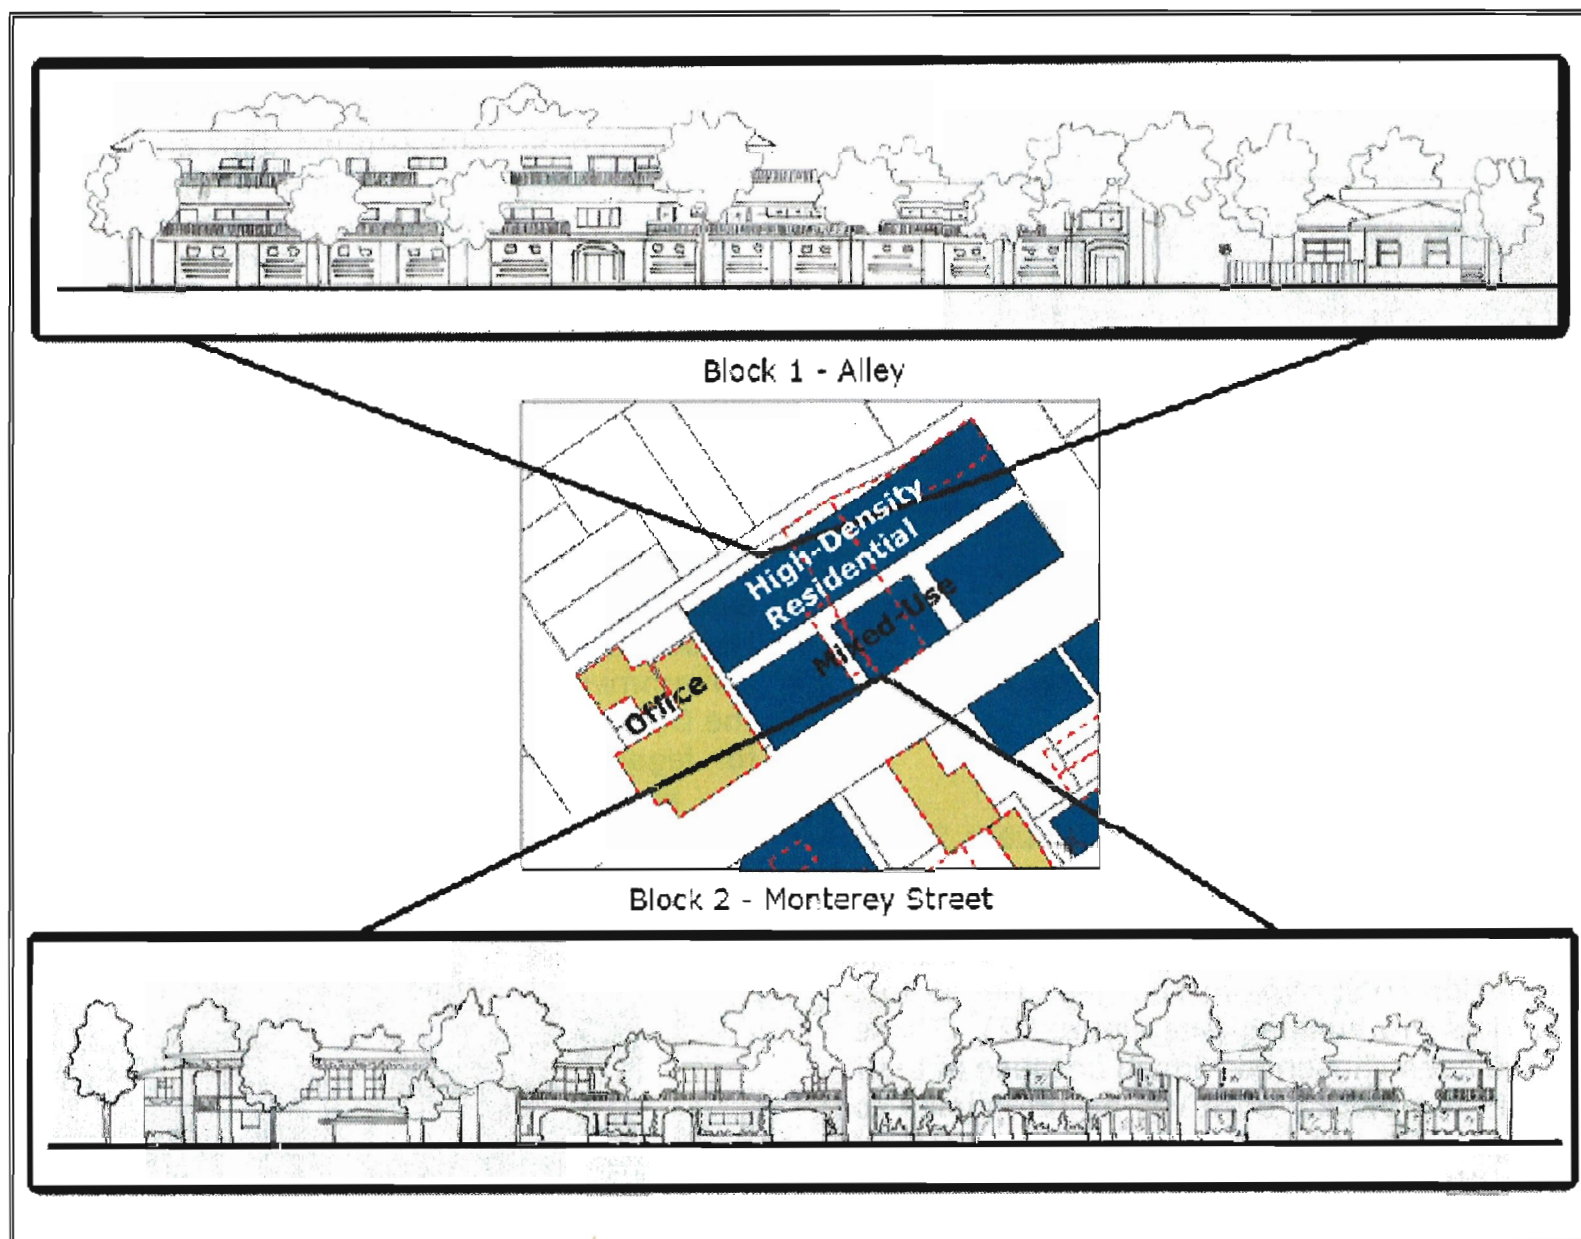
Proposed Site Plan and Street Elevations for Blocks 1 and 2
